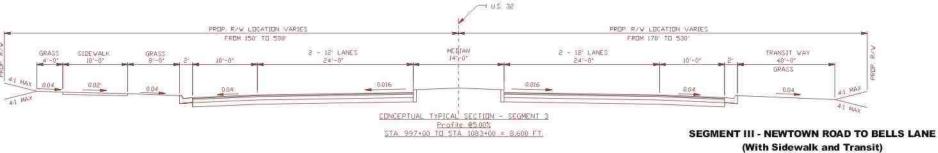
Red Bank and SR 32 Roadway and Transit Typical Sections
